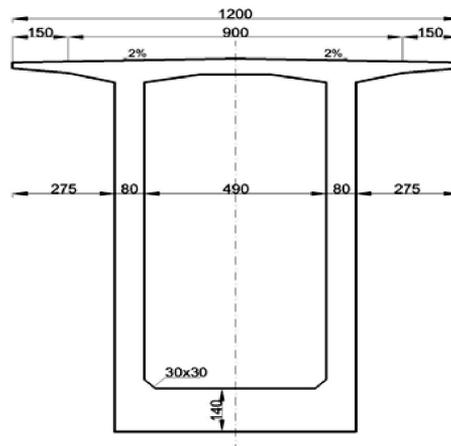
The cross-section of the girder at the pier (unit: cm)
